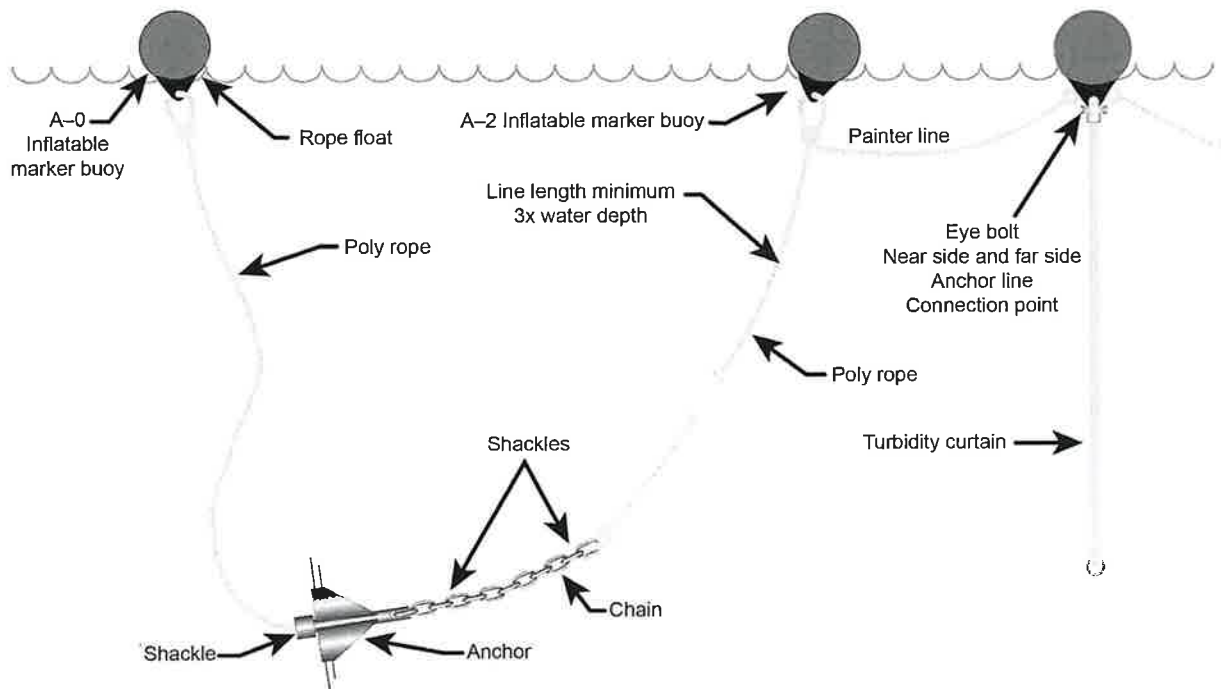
Turbidity curtain anchoring detail (GEI Works).
